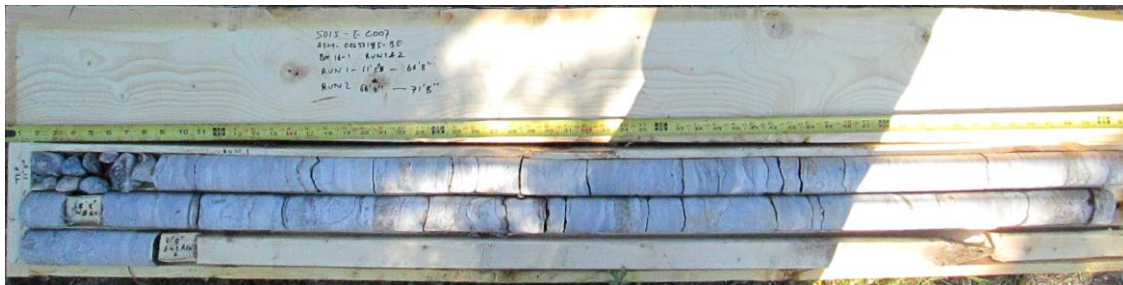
Core Sample for BH 16-1 from Elevation 158.9 m to 155.8 m
